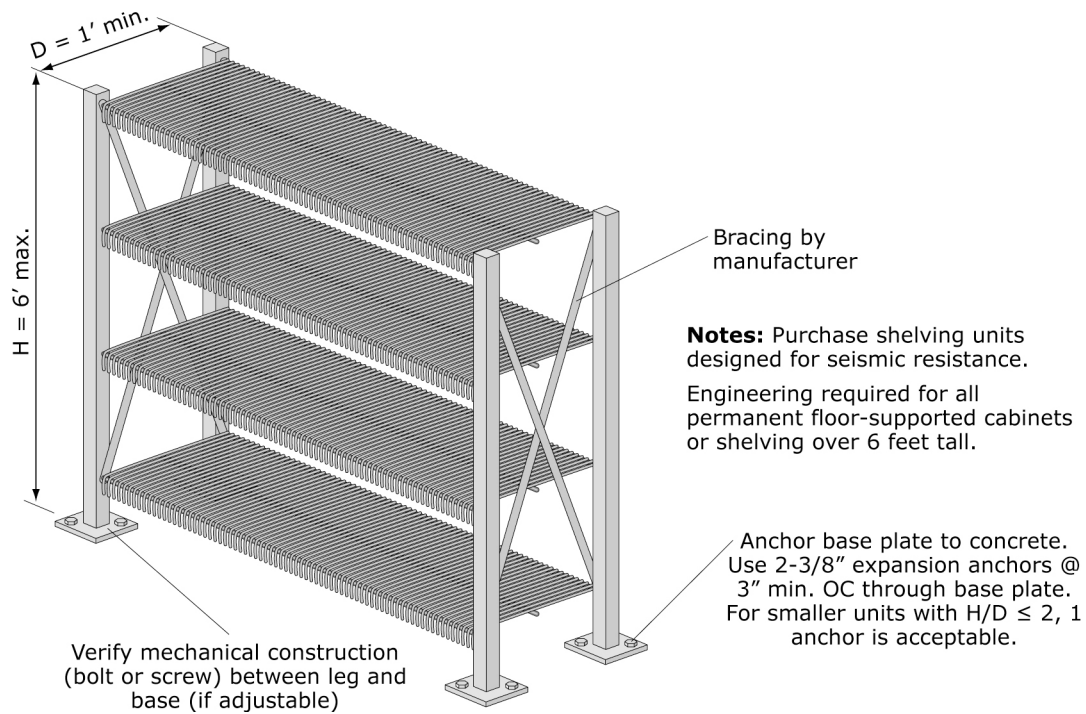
Light duty shelving (NE, ER).
